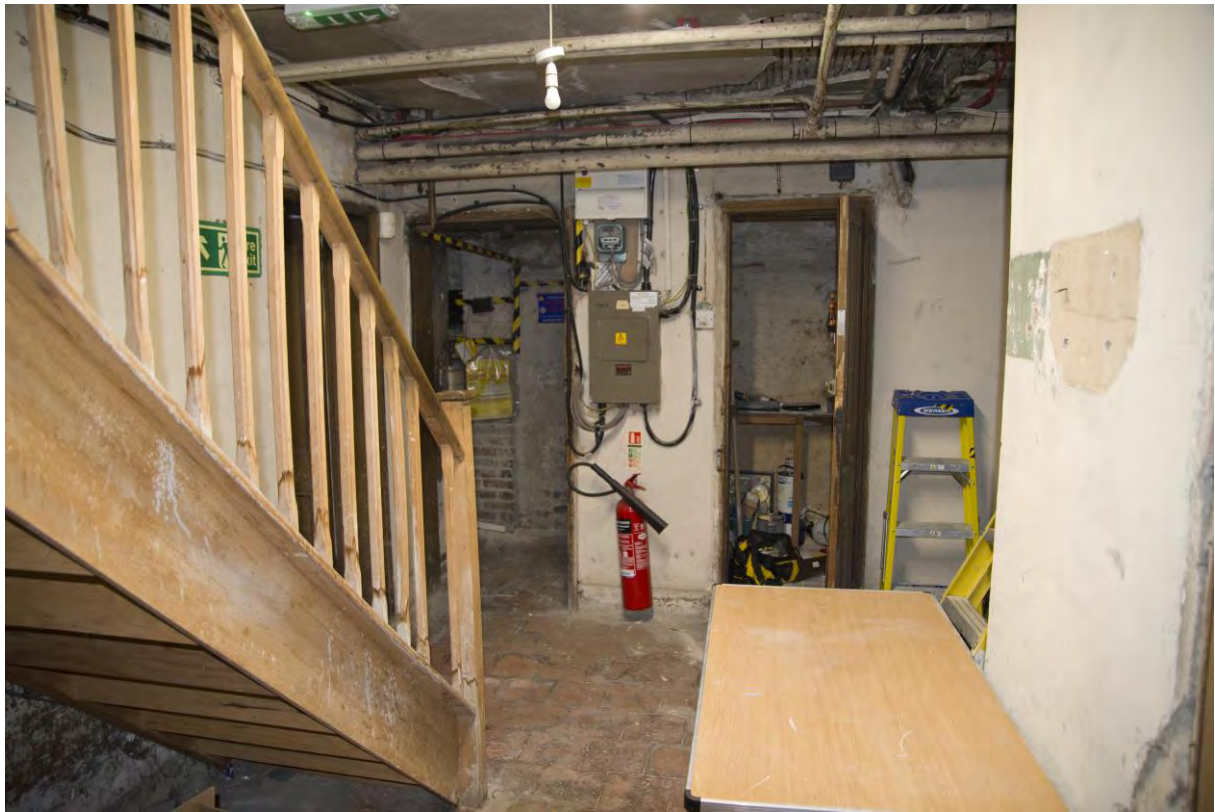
No. 25 Queen's Road, middle cellar room, looking east.
